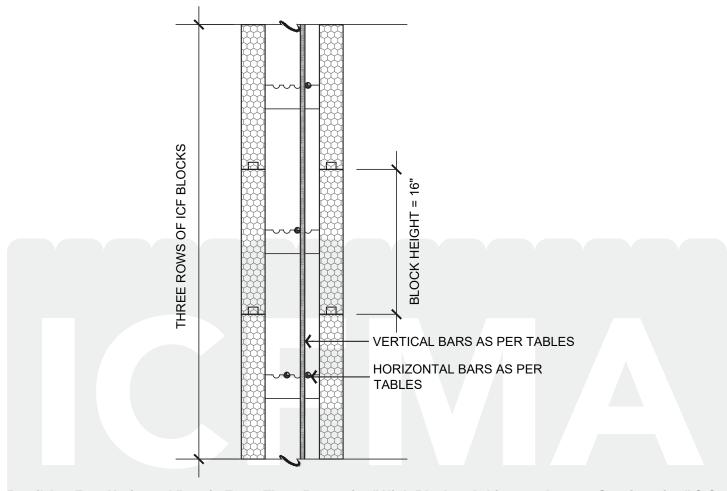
Above Grade Wall Reinforcing Placement for 12" Thick Walls.
